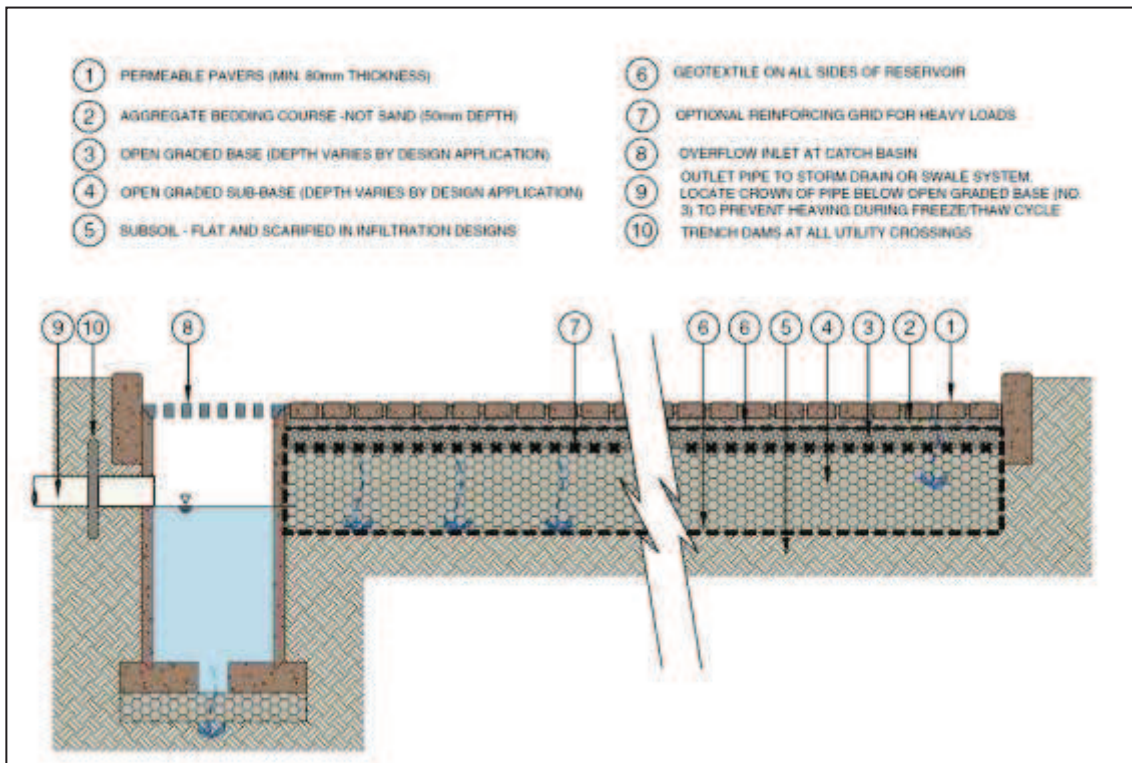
Permeable pavement with full infiltration. (GVRD, 2005)
